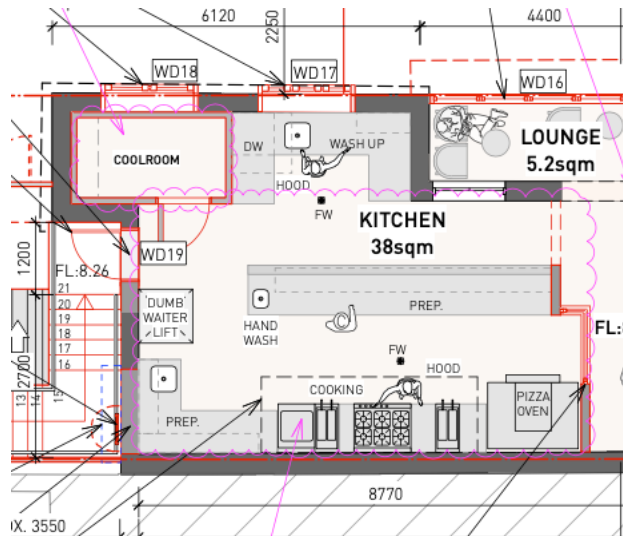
, First Floor: Existing cool room to be replaced with new cool room. Dumb waiter relocated, kitchen equipment layout changed.
